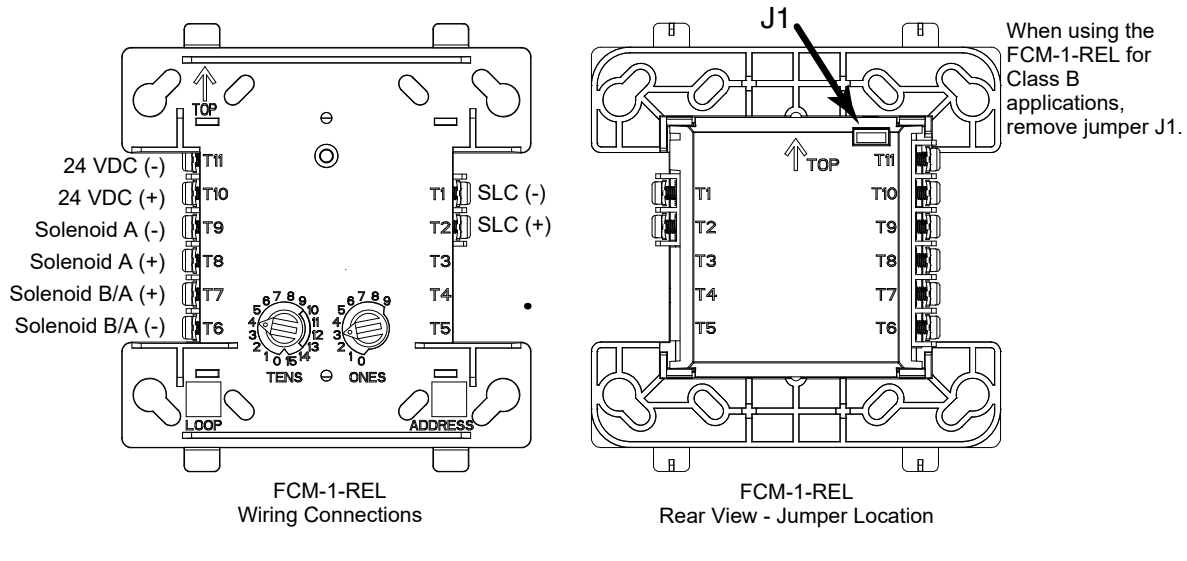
FCM-1-REL Wiring Locations and Rear View - Jumper Location
